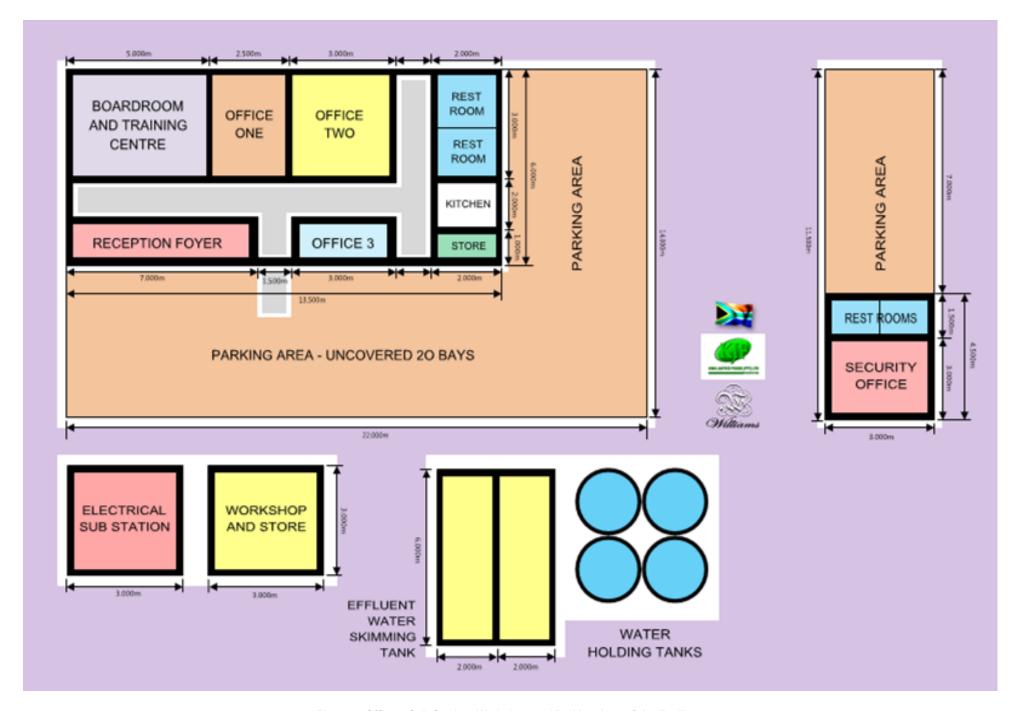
Offices, Sub-Station, Workshop and Parking Area of the Facility
